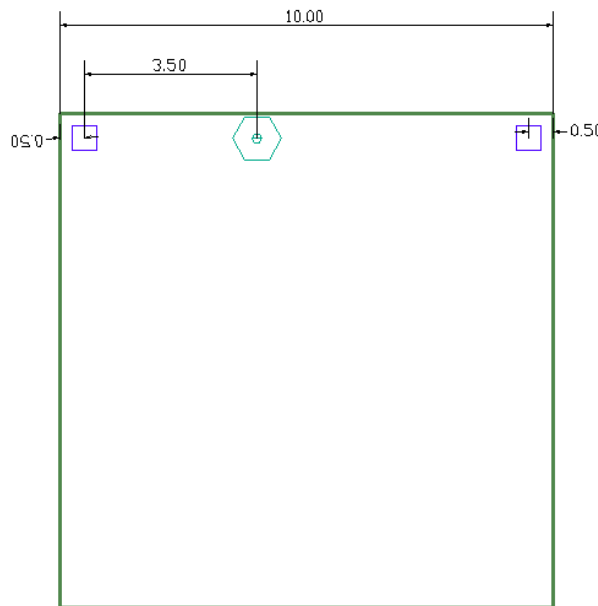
SLAB SUPPORTED ON TWO COLUMNS WITH A POINT LOAD
